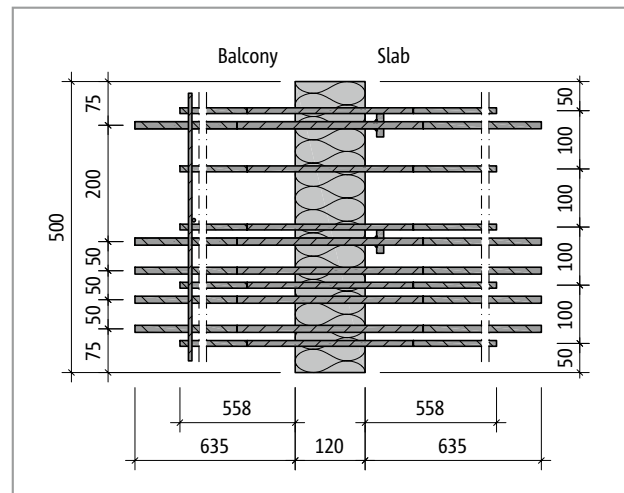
Schöck Isokorb® XT type C-R-M1-V1: Product plan view
